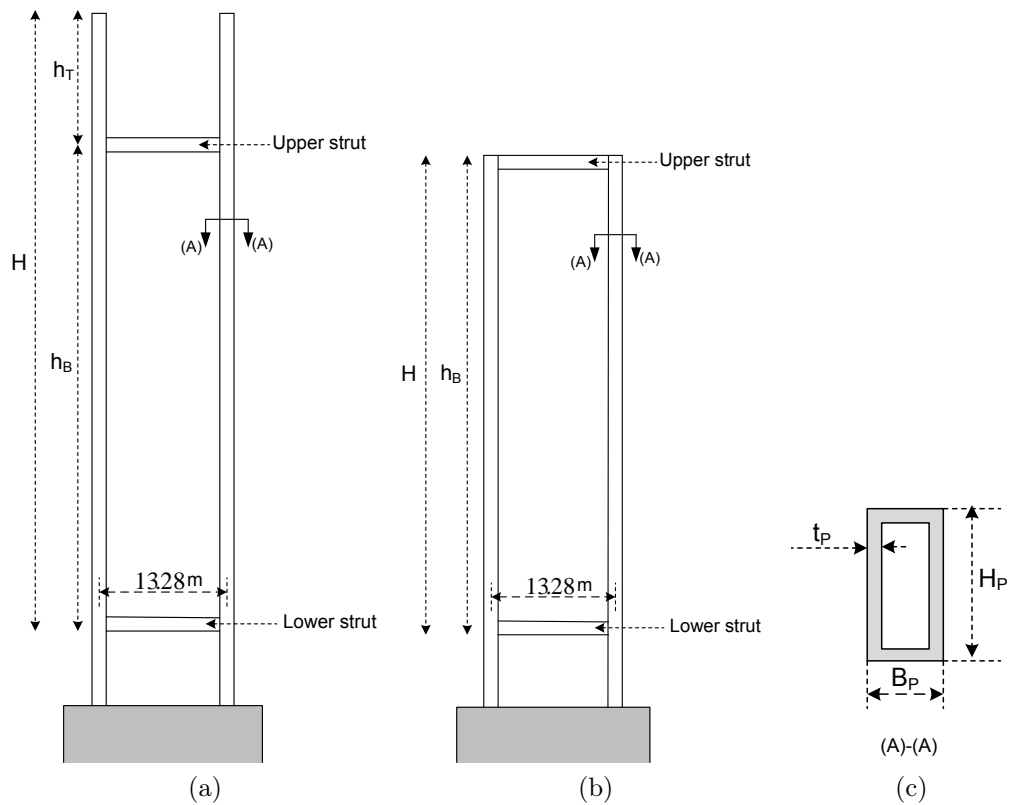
Pylon elevation of three arrangement of cable-stayed bridges (a) Pylon elevation for semi-fan (b) Pylon elevation for harp and fan (c) Pylon cross-section.
